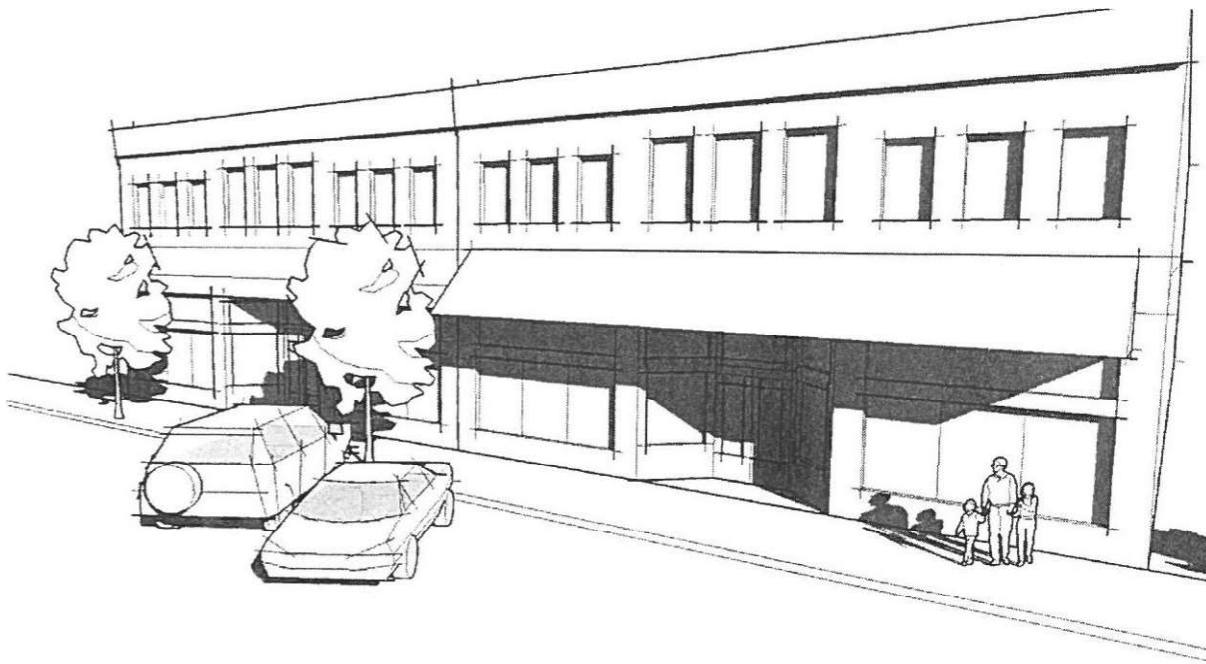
Building elevation showing window and canopy options in the Town Center overlay. This sketch provides greater glass percentages than actually required. (Town of Rockford)
